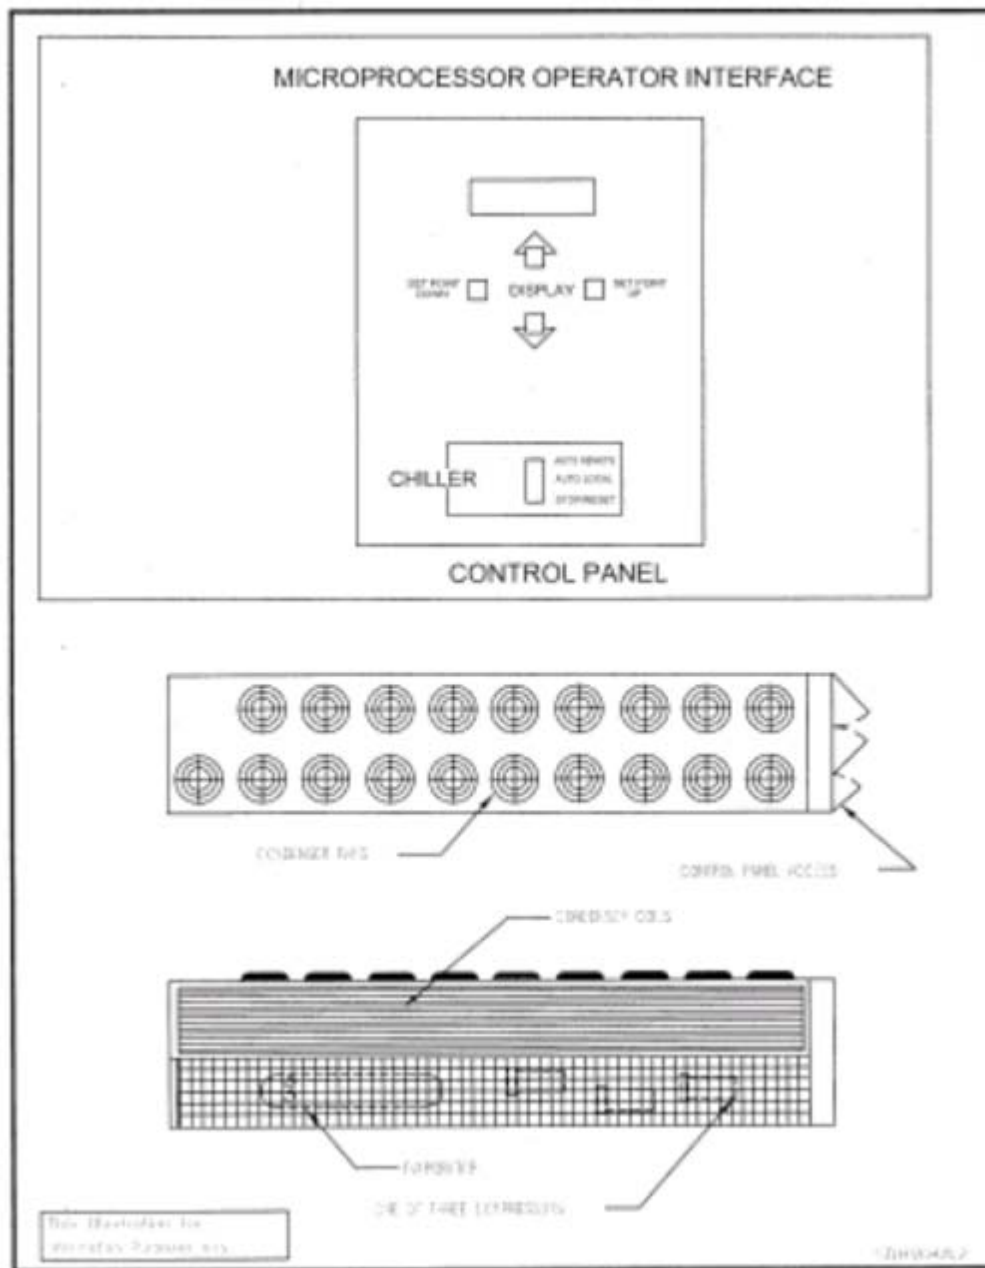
CW02 Chiller, Component Schematic and Panel Layout
